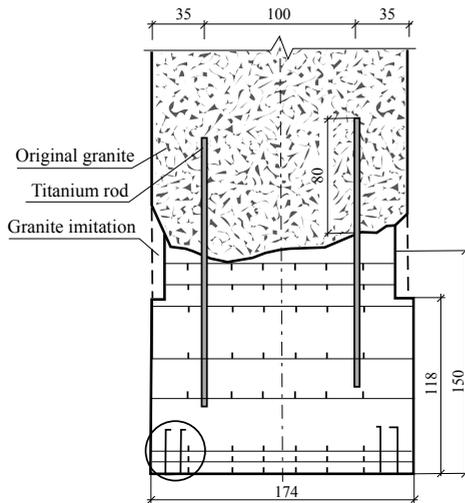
Details of the reinforcement of the reconstructed lower segment.
